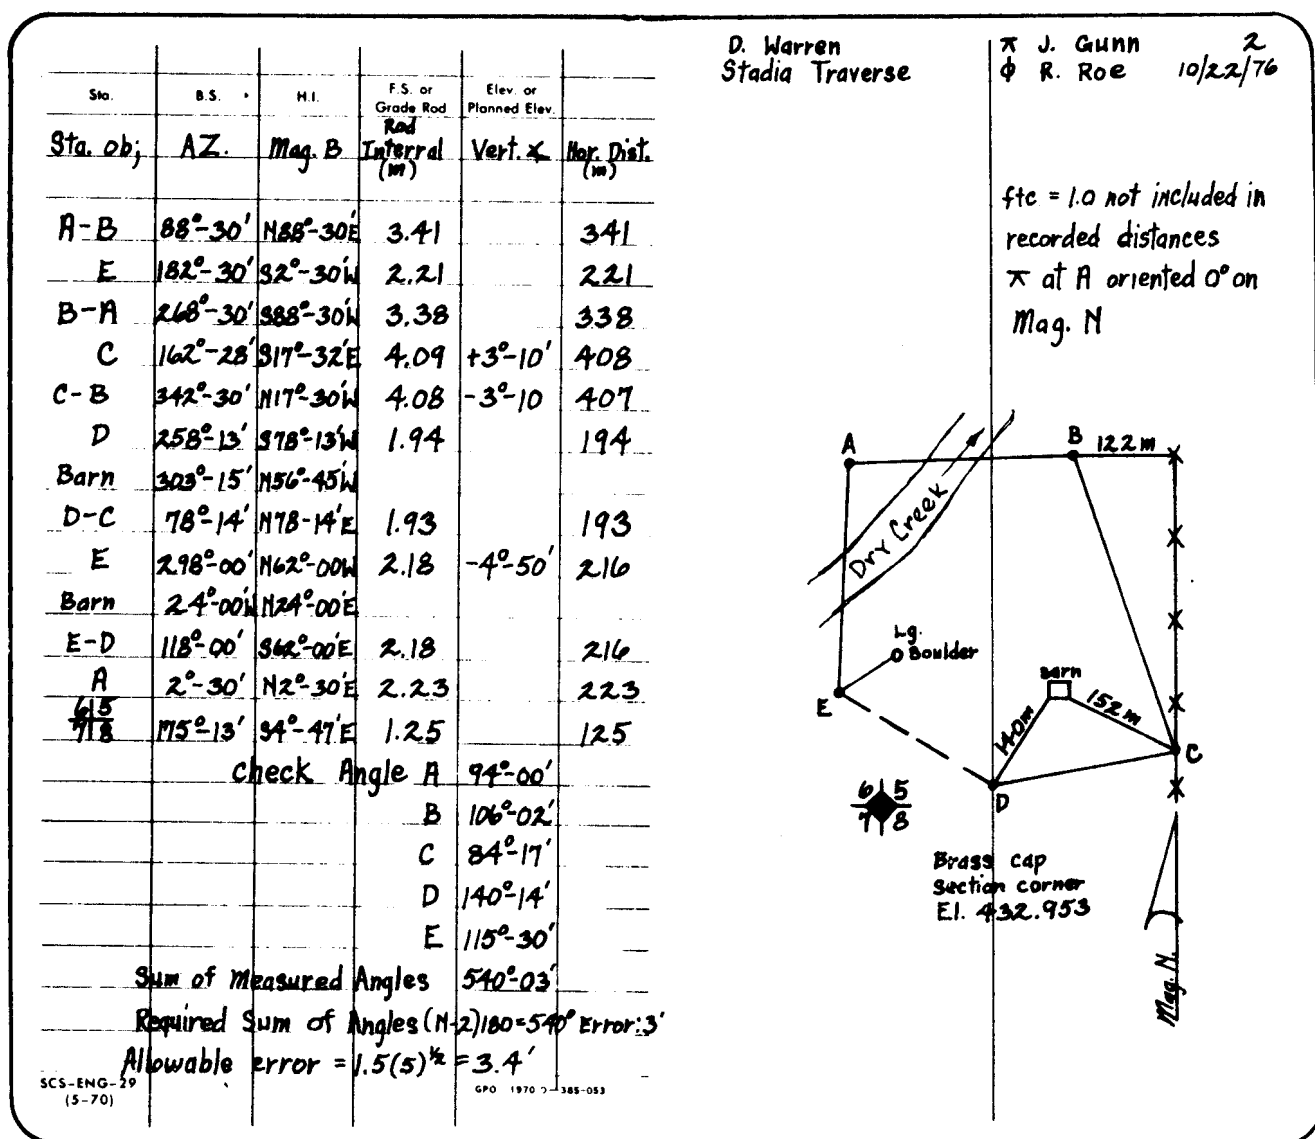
Survey notes—stadia traverse survey for horizontal control (metric).
